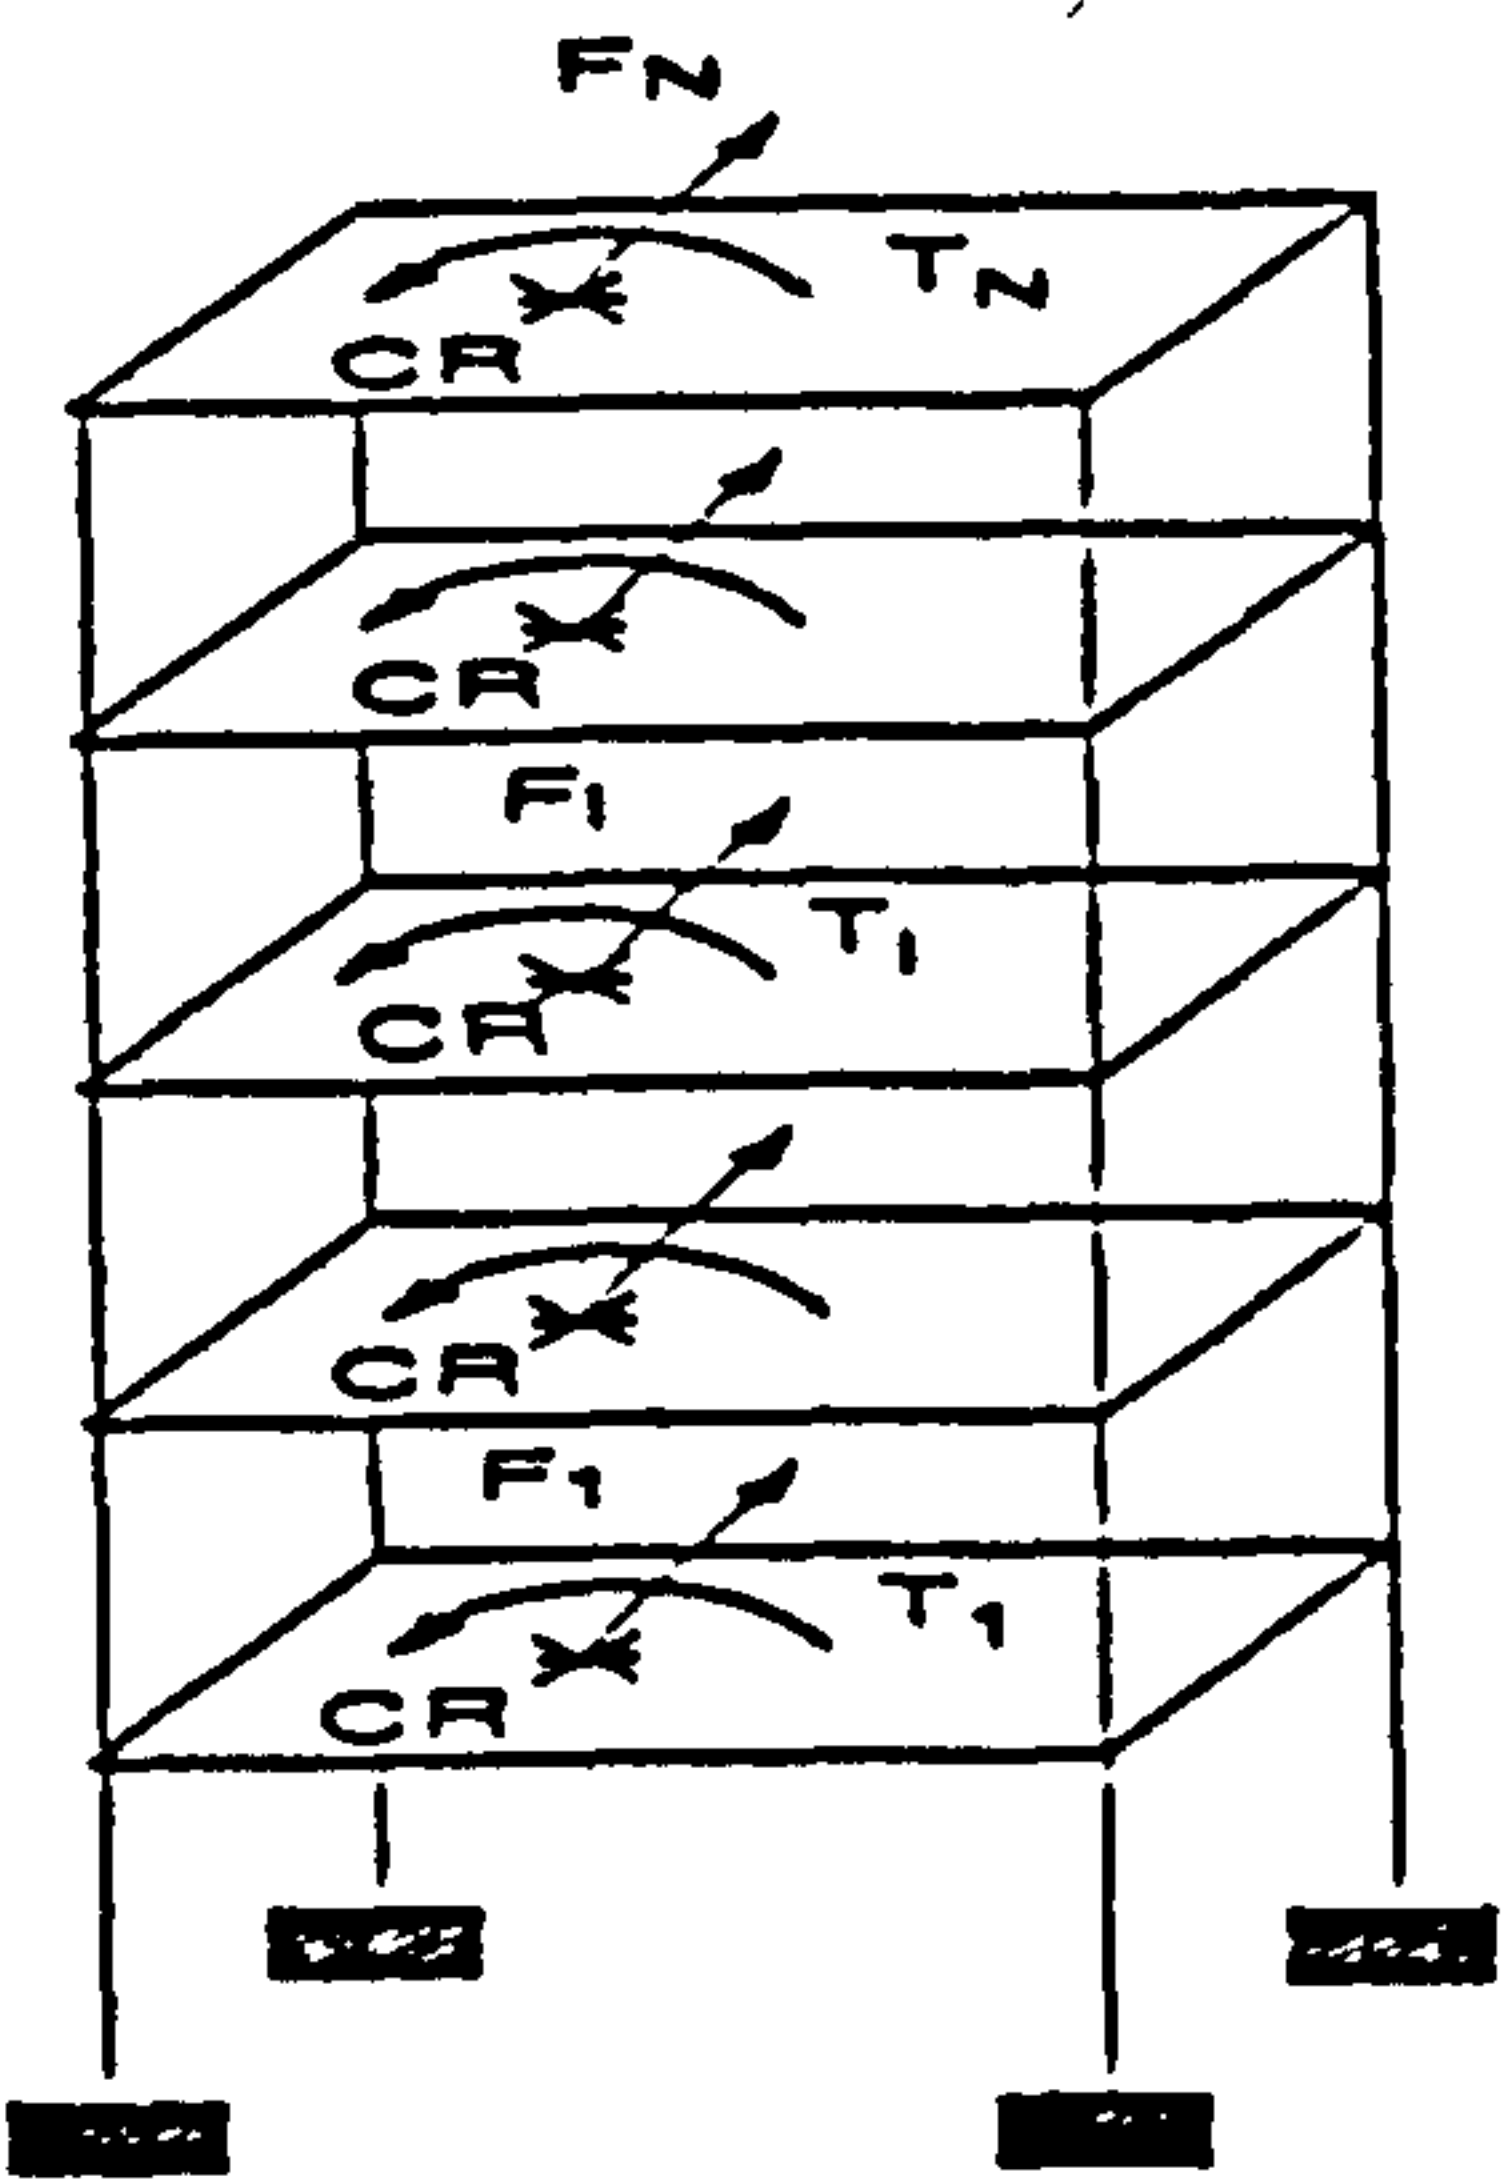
Floor torques and lateral forces acting at floor levels
